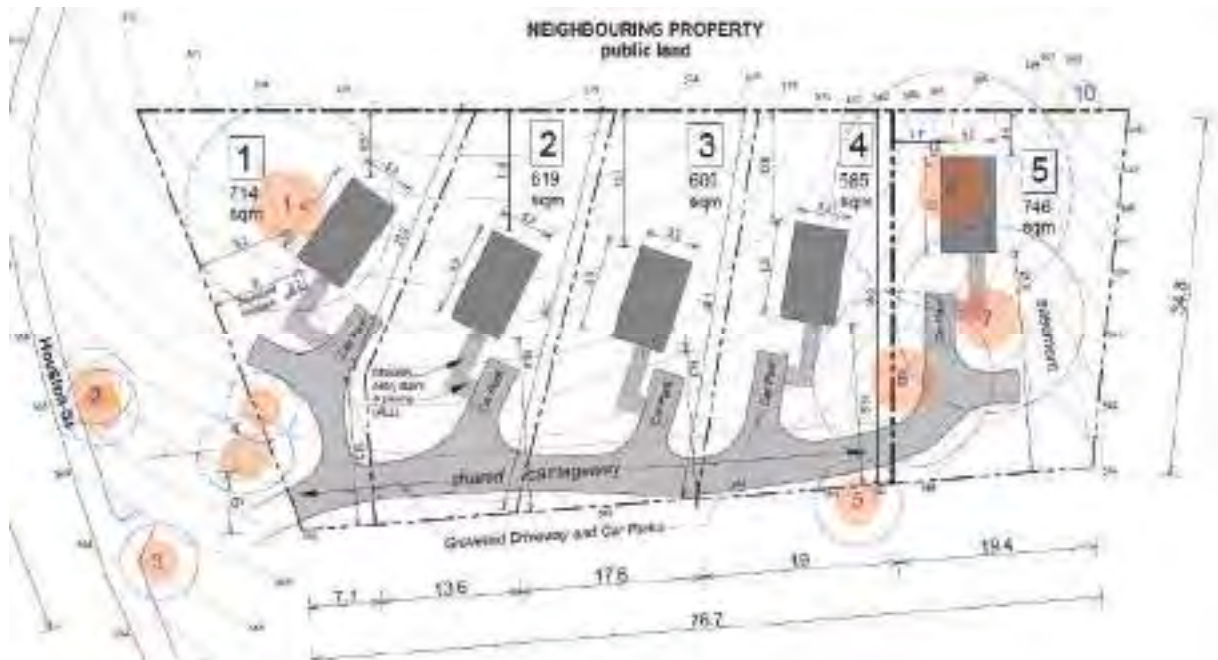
The proposed site plan with the TPZ and SRZ of existing trees shown.
